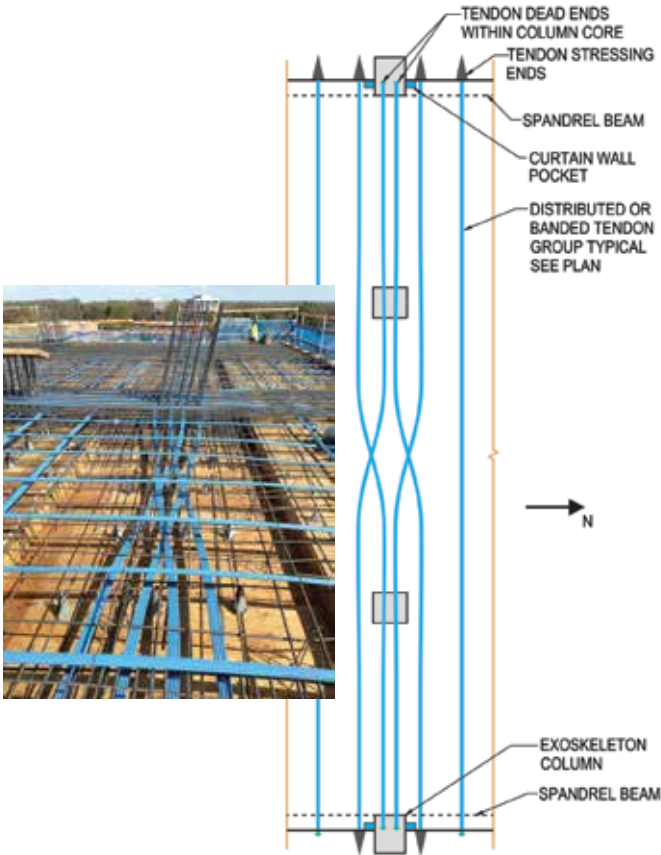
The post-tensioned (PT) tendons were crossed at midspan to conceal the dead-end anchors inside the exoskeleton columns (photo courtesy of DAVIS)
